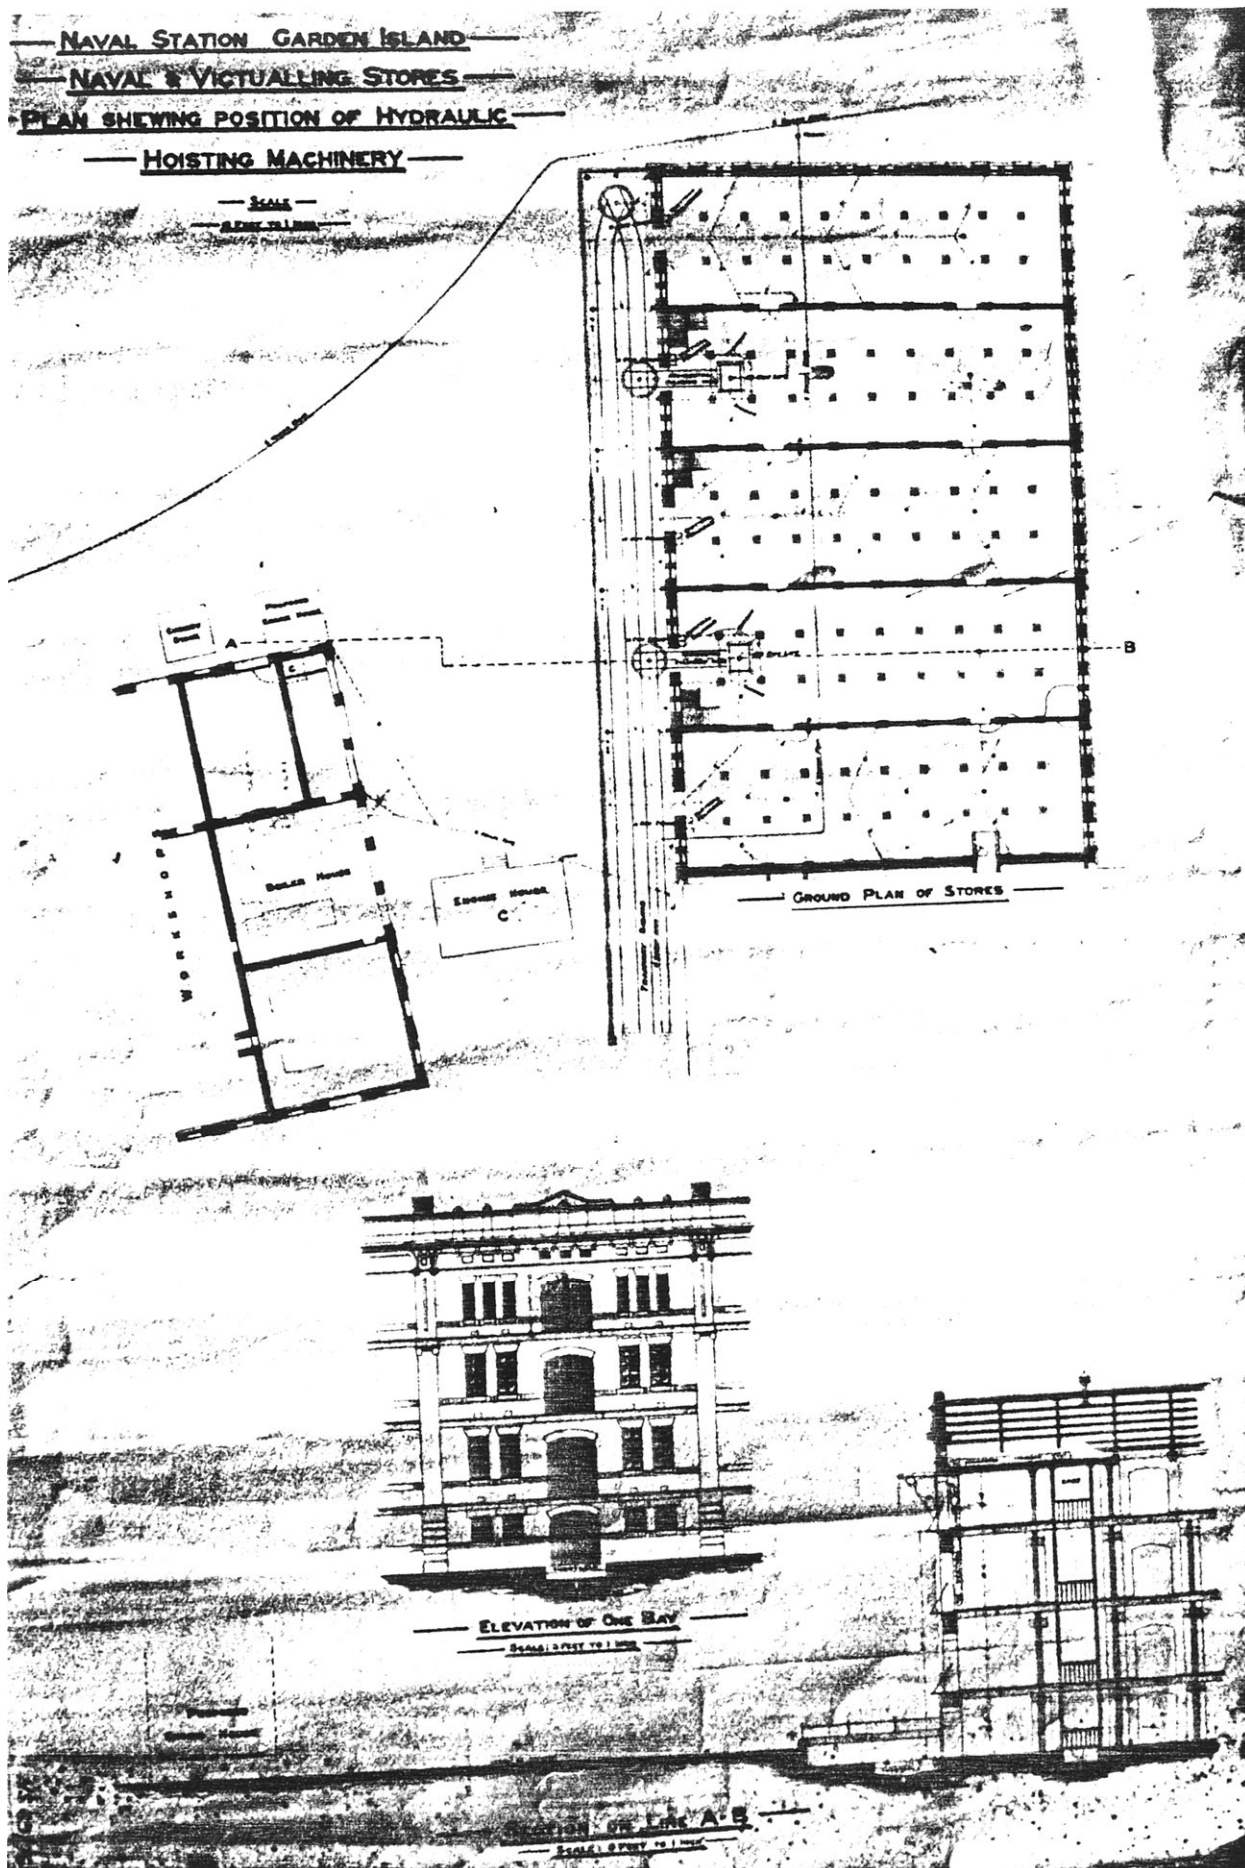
Naval Stores - Plan of Hydraulic Hoisting Machinery, 1892
